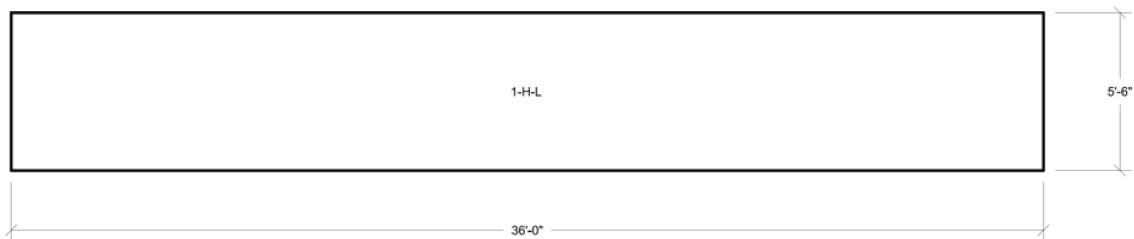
H.7-17 Tunnel and Access Region Basemat Looking Down Transverse Reinforcement Zones
